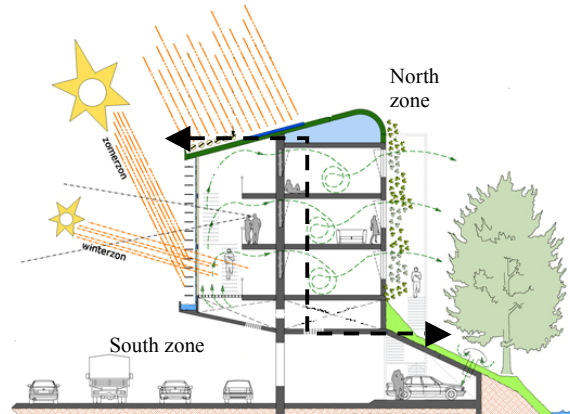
Cross section of the Living Wall design showing division of north and south insulation/window zones. Image courtesy of Narrativa ArchitecteN.
